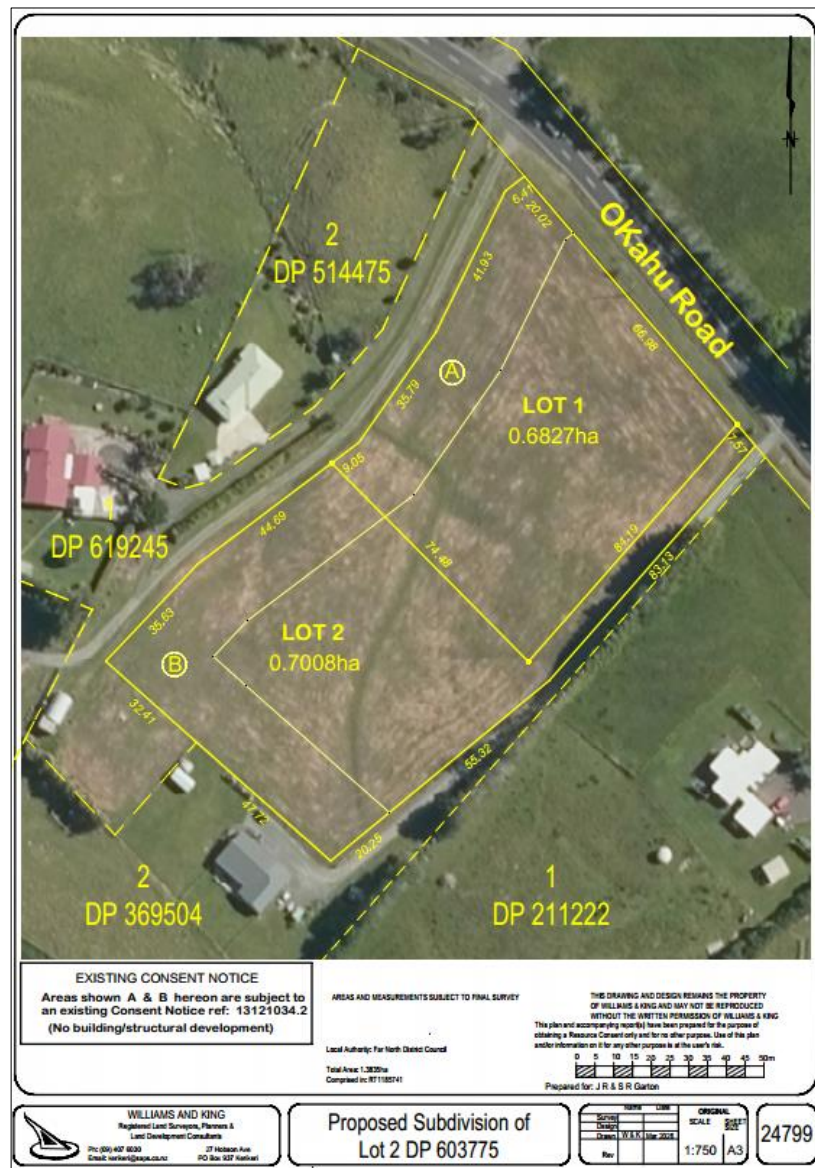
Subdivision Scheme Plan depicting the proposed development (from Williams & King).
